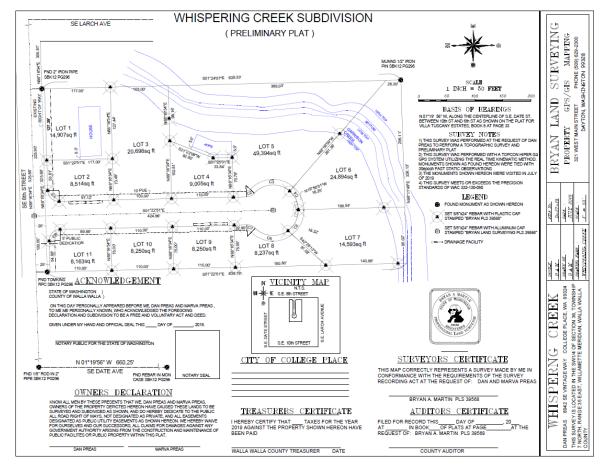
Preliminary design plan for construction of the Whispering Creek Subdivision provided to NWA by Dan Preas (Preas 2019).
